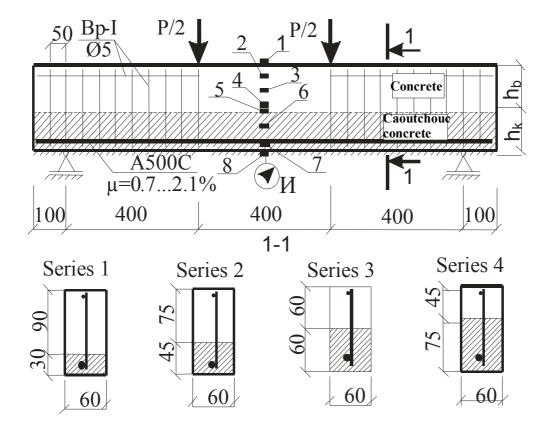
The scheme of reinforcement and testing of the beams: 1—8 are resistance strain gauge for determining longitudinal deformations; h_k is caoutchouc concrete layer height; h_b is concrete layer height
